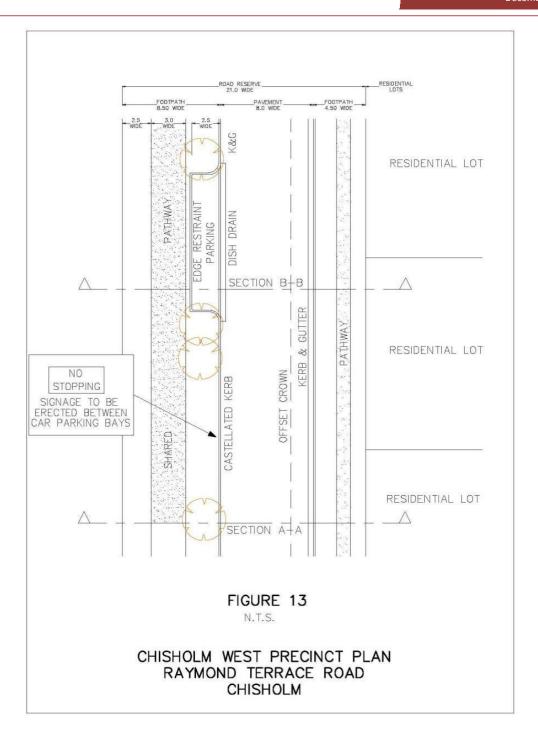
Chisholm West Precinct Plan - Raymond Terrace Road.
